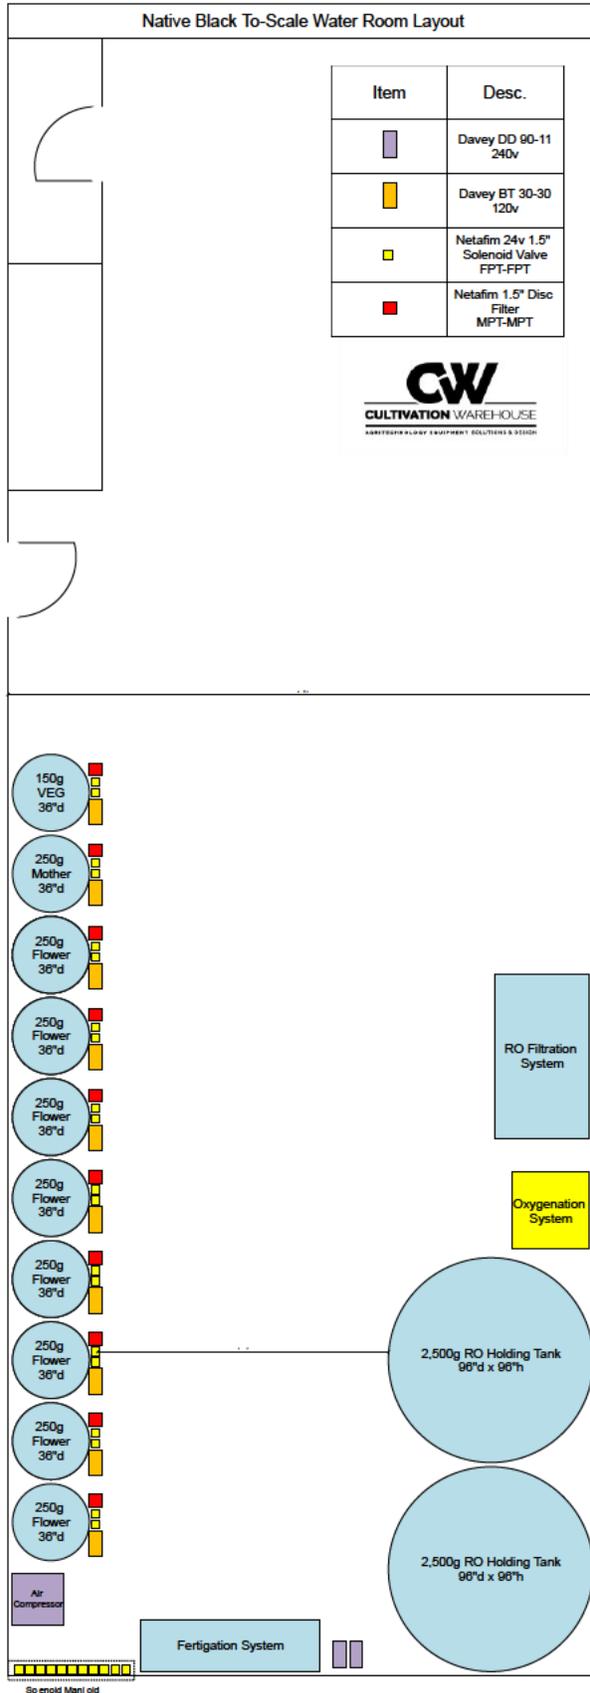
Engineering Plans and Specifications (Cultivation Facilities).
